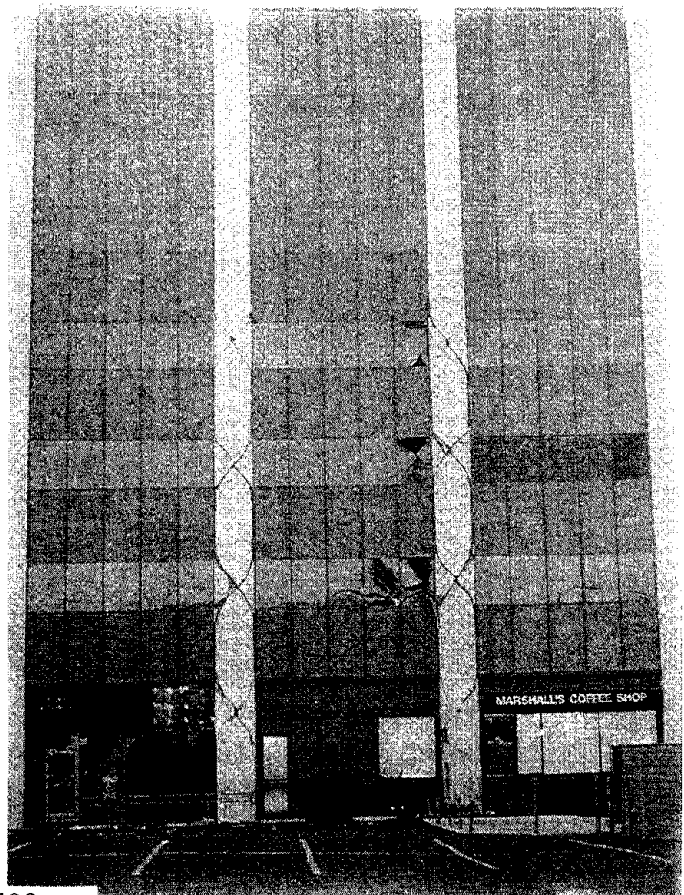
The first-story columns of the steel-framed building housing the American Savings Bank on Topanga Canyon Road in Canoga Park flexed during the quake and ended up slightly displaced from their original positions.
